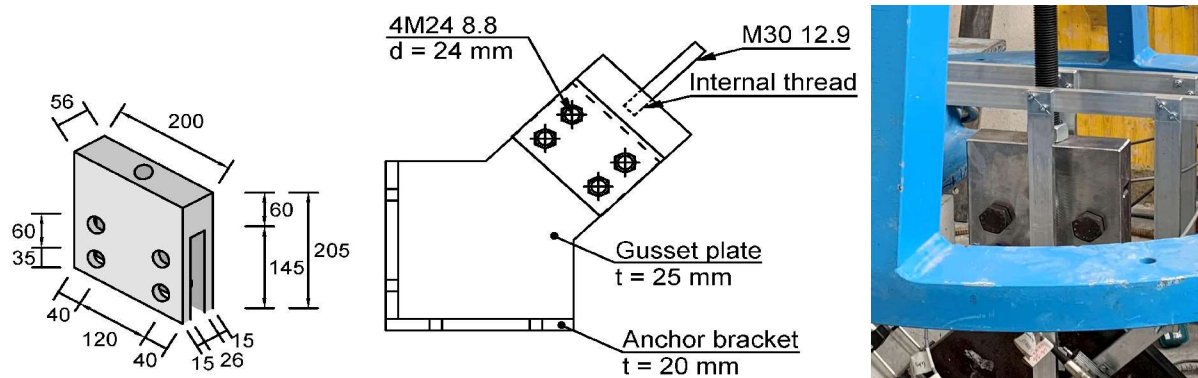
Dimensions of the U-shaped fixture and schematic description of the load application. (Note: All dimensions are in mm).
